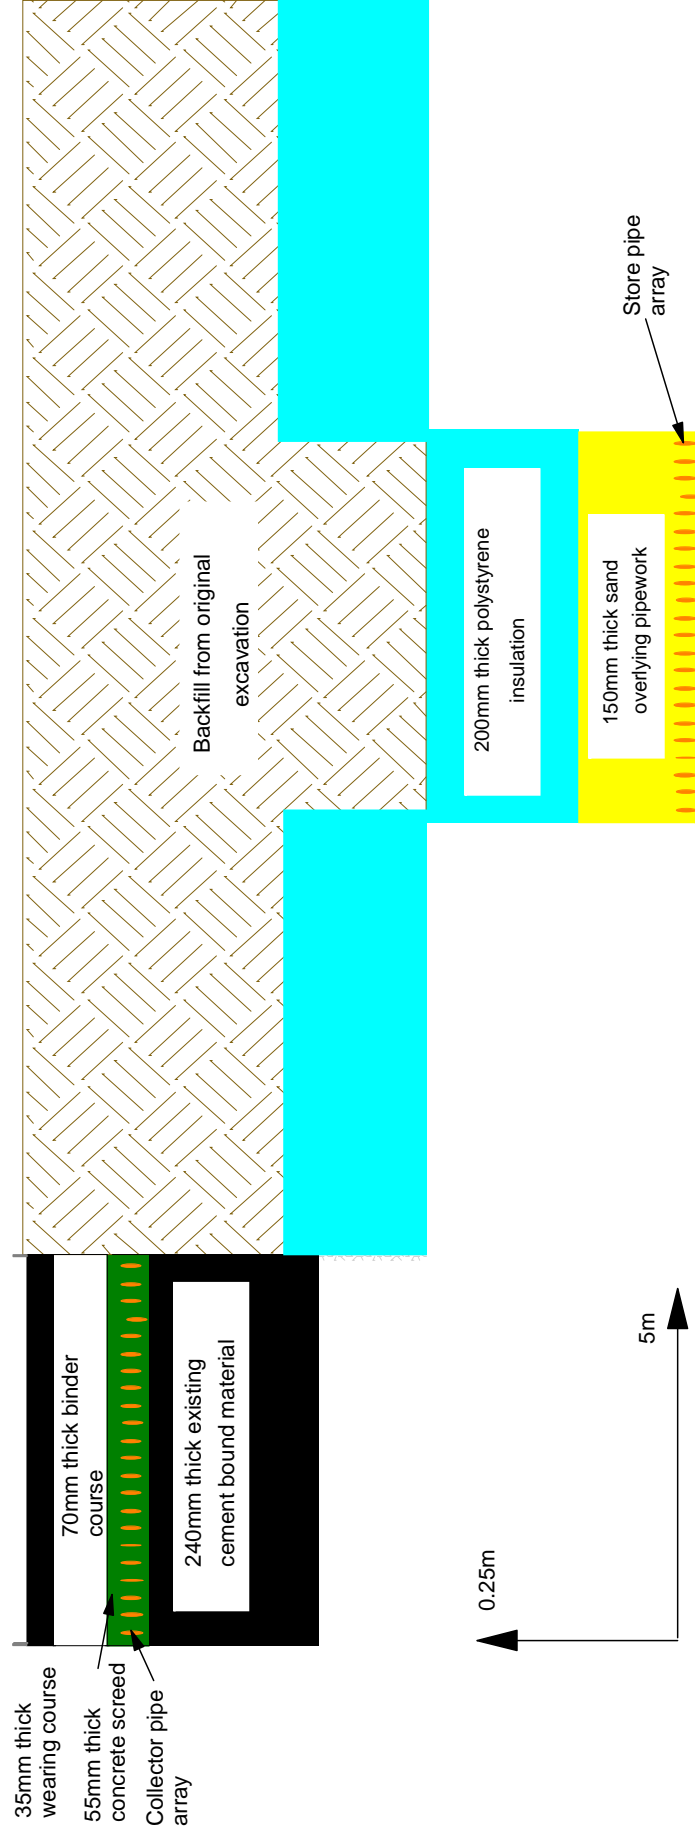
Cross-section through collector 1 and the off-road store 1
